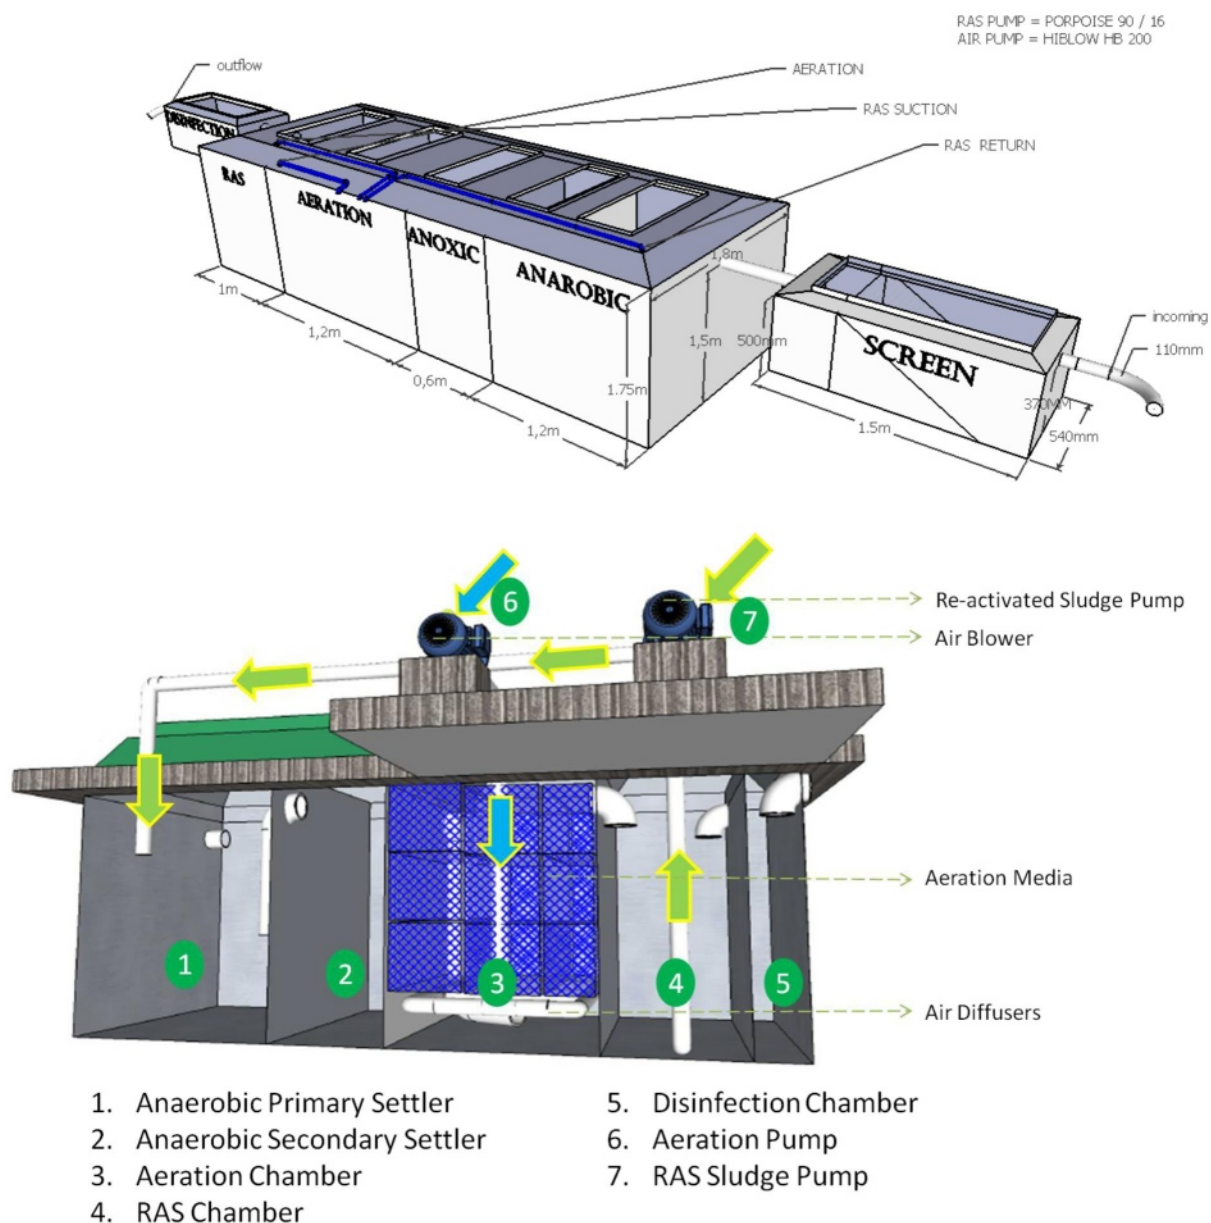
Proposed sewage treatment plant (RAS – Return Activated Sludge)
